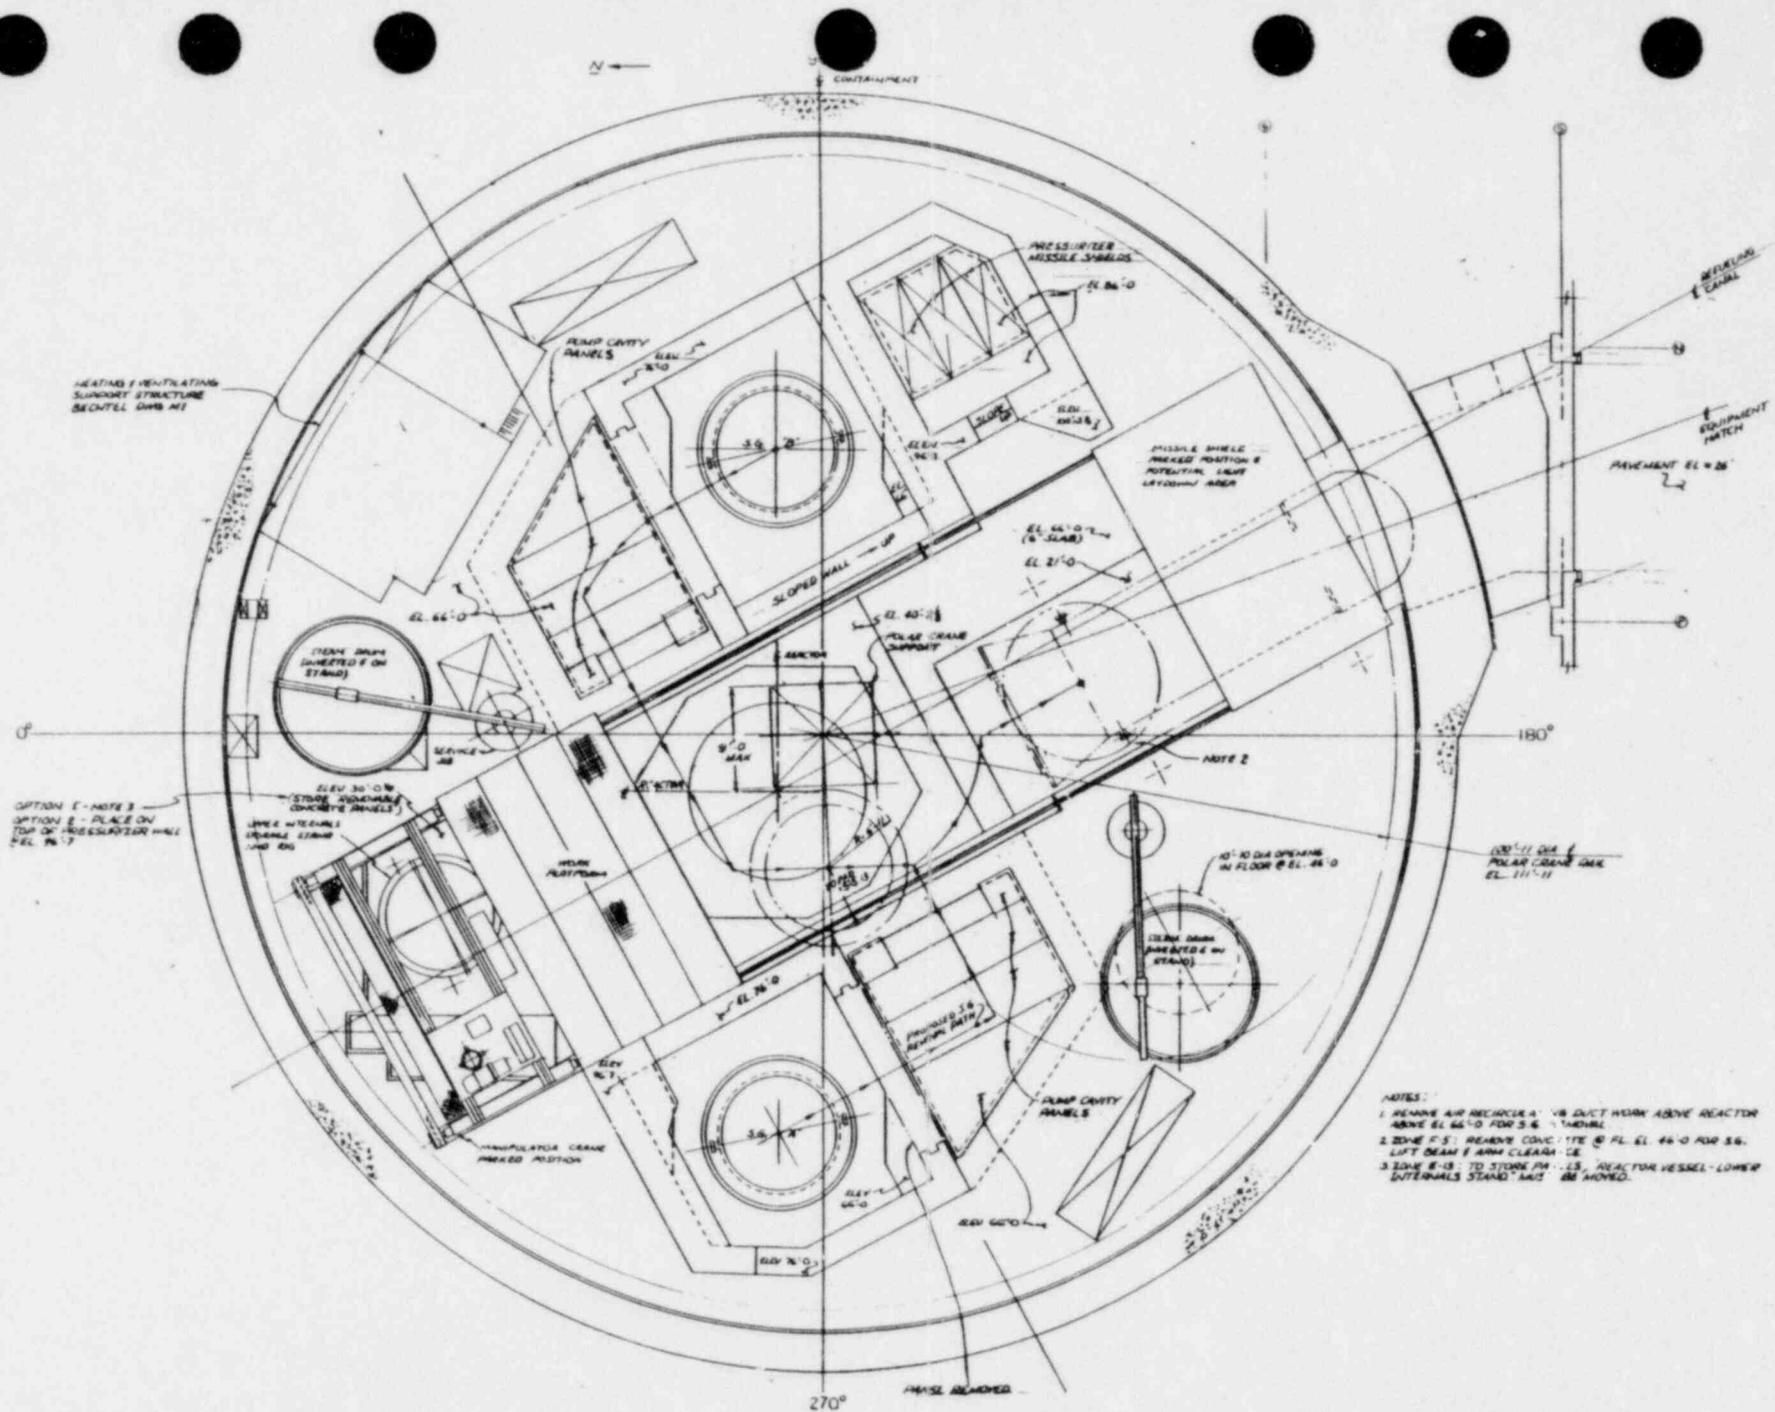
Lower Assembly Removal Sequence (Sheet 2 of 2)
